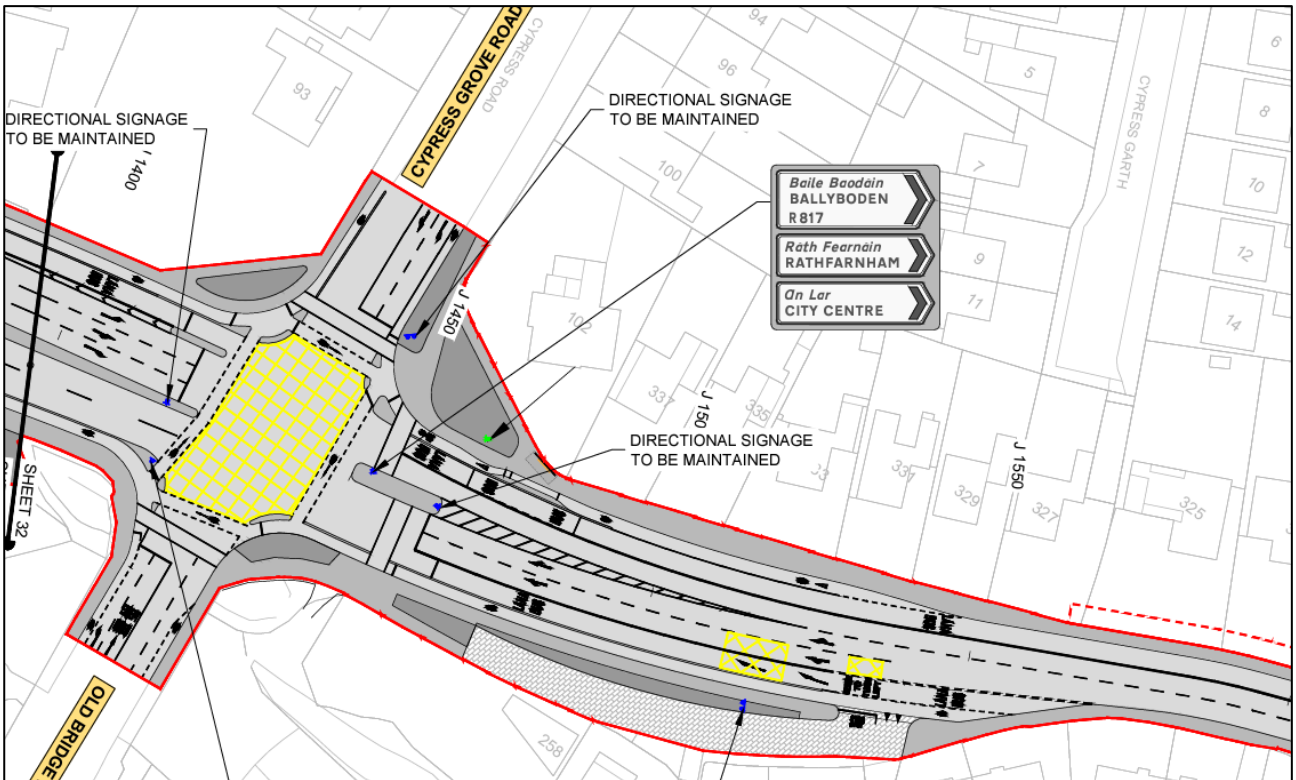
Extract from Traffic Signs and Road Markings Drawings (Sheet 32)
